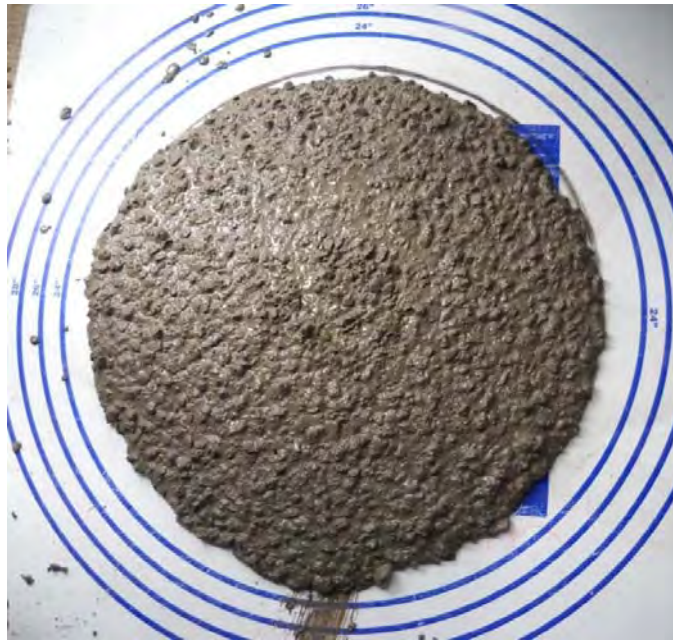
Self-Consolidating Concrete with a 20-inch Slump Flow Used in Drilled Shaft Construction
